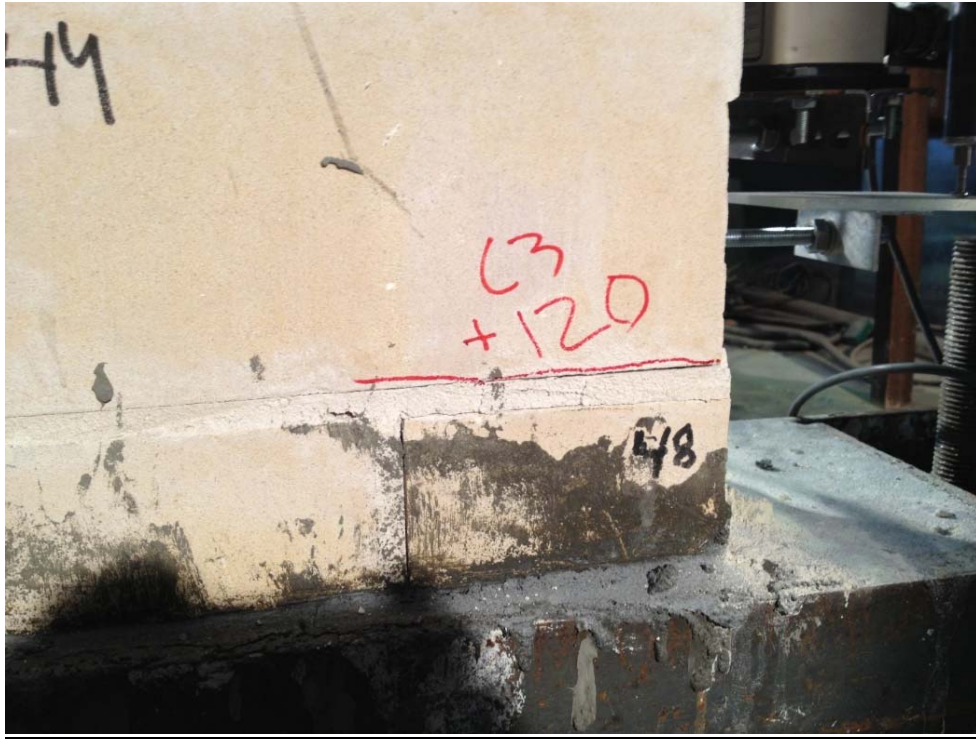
Damage associated with 2.4 mm push loading Wall-1.7
